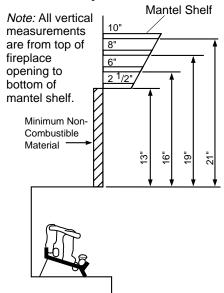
Minimum Mantel Clearances for Built-In Installation
